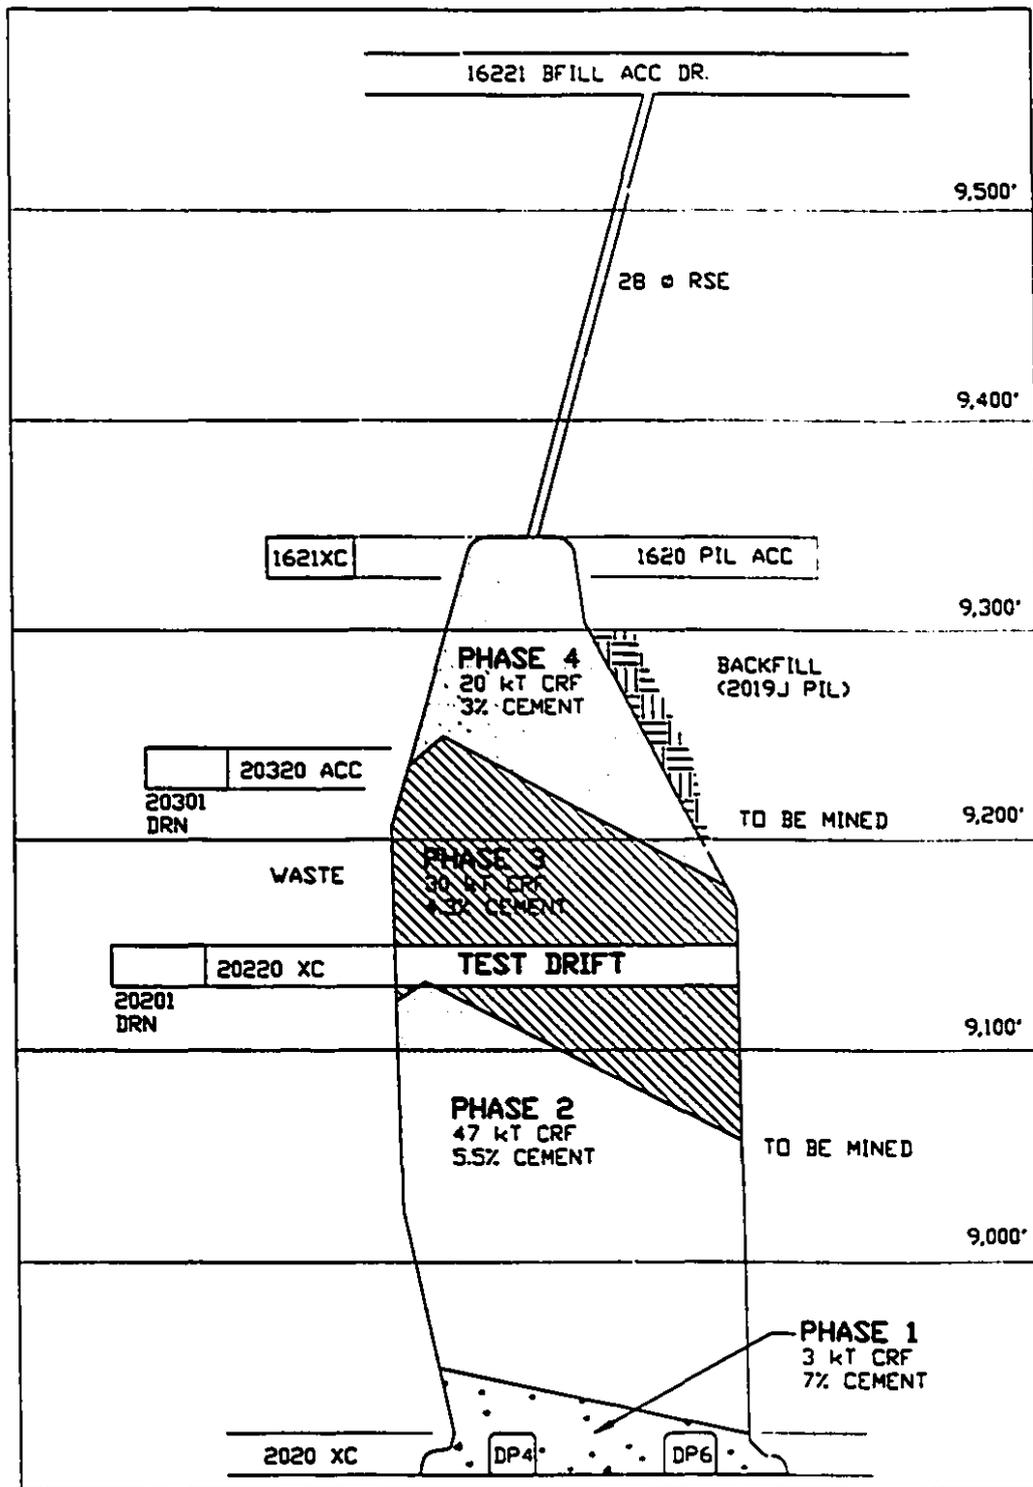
2020-L-PIL LOOKING NORTH
